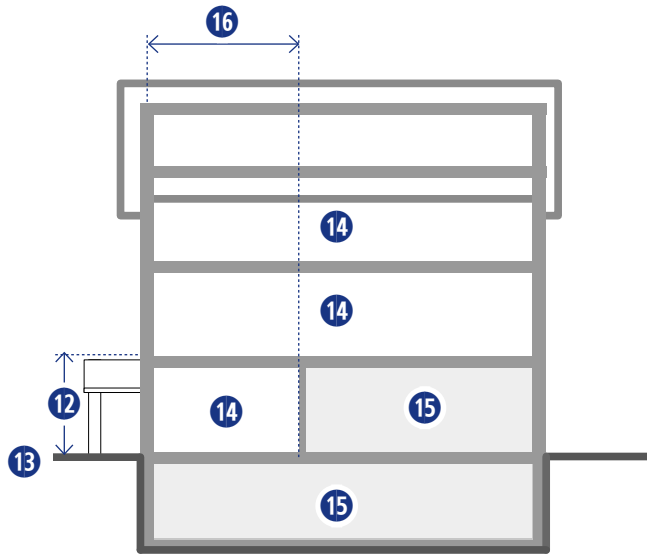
Detached House Building: Floor-to-Floor Height & Use Requirements
